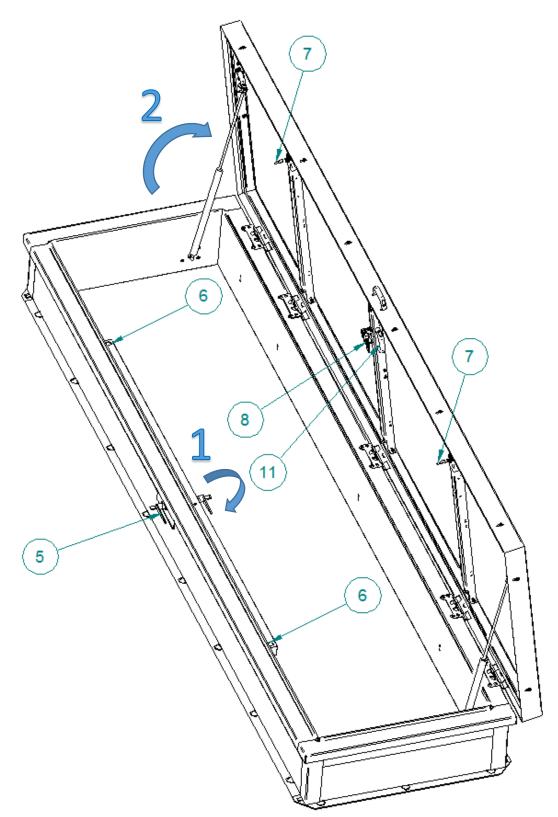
mcr PROROOF ST roof access hatch with type 2 locking mechanism (gas spring-integrated locking mechanism) - opening and closing.
